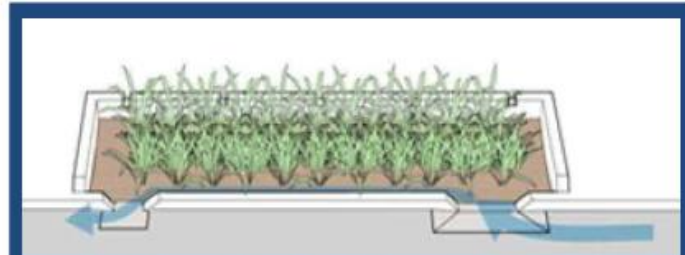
Outlet Curb Cut Opening – Through-Flow Type (NACTO, June 2017)
